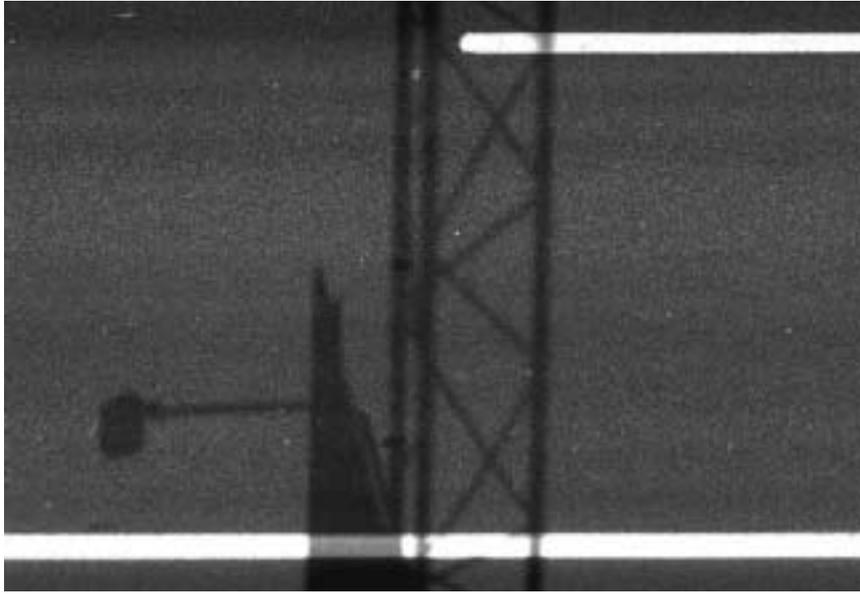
Shadow of a sign reflector visible on the pavement image
